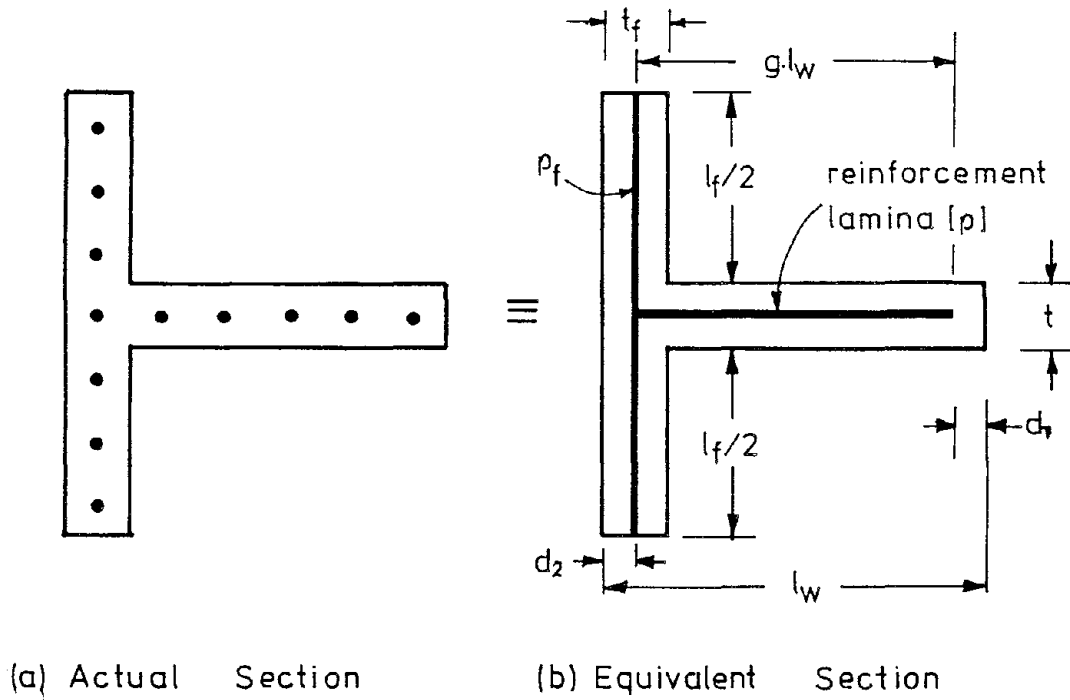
PLAN DIMENSIONS OF T-SECTION WALL
